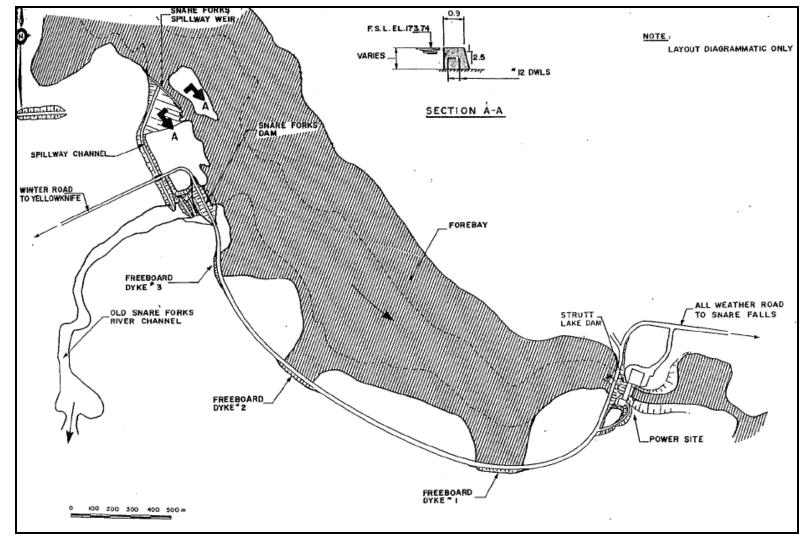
Snare Forks G.S. – General Arrangement Layout
